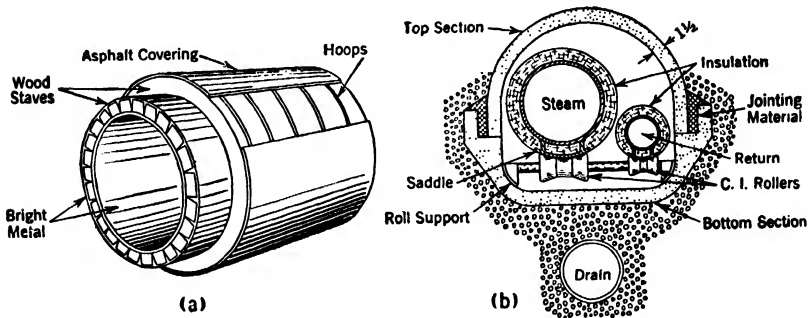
(a) Wood-stave pipe conduit. (b) Precast concrete pipe conduit.
